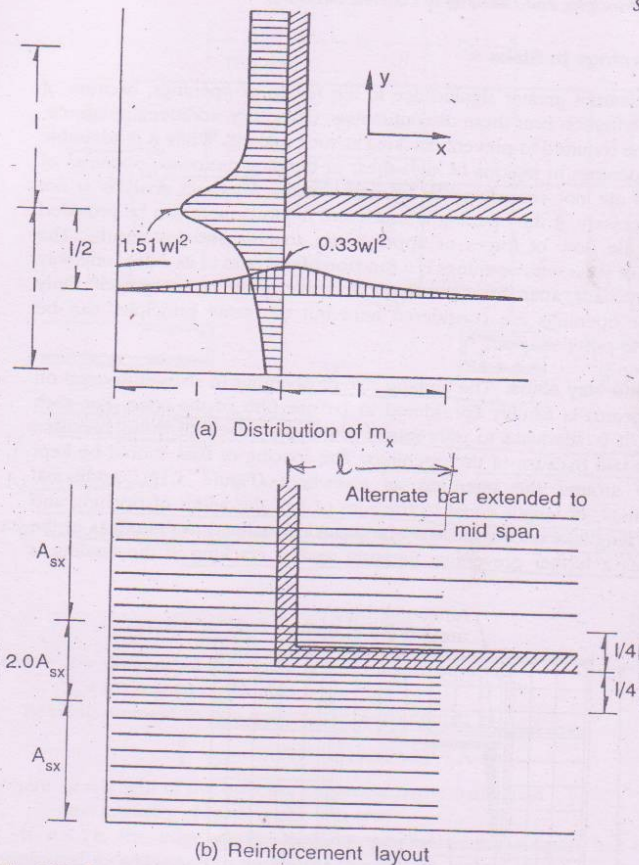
Cantilever corner slab under uniformly distributed loading (Moments and reinforcement layout in y -direction obtained by reversing the axes)
